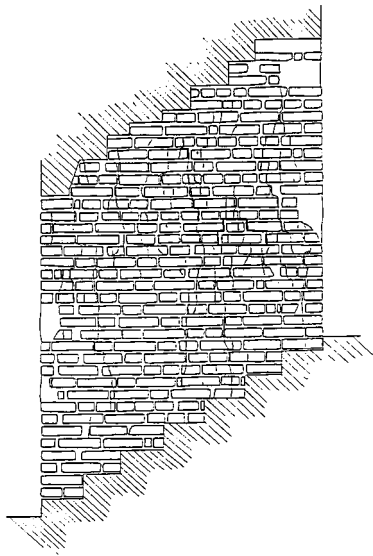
Diffused crack pattern at the entrance (height 11 m) of the bell tower.
